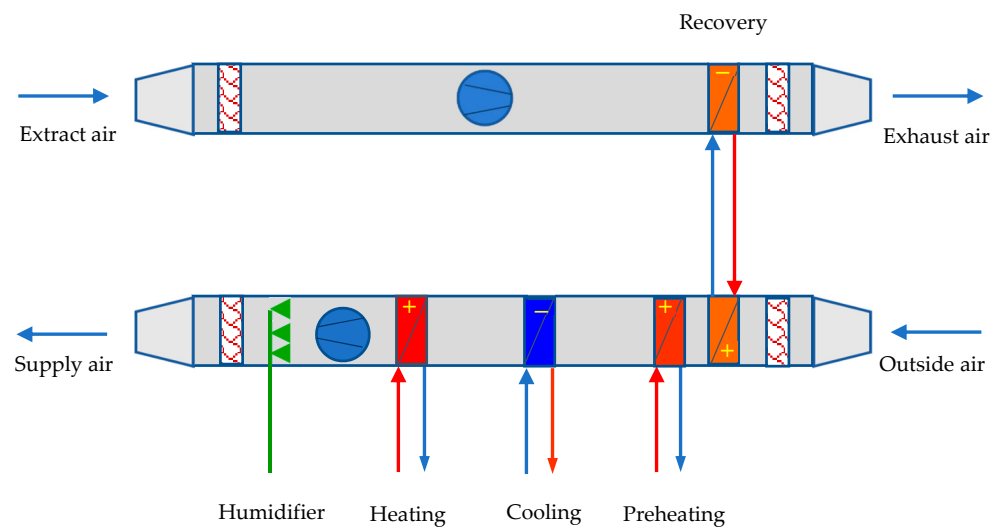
Diagram of heating, ventilation, and air conditioning (HVAC) equipment.
